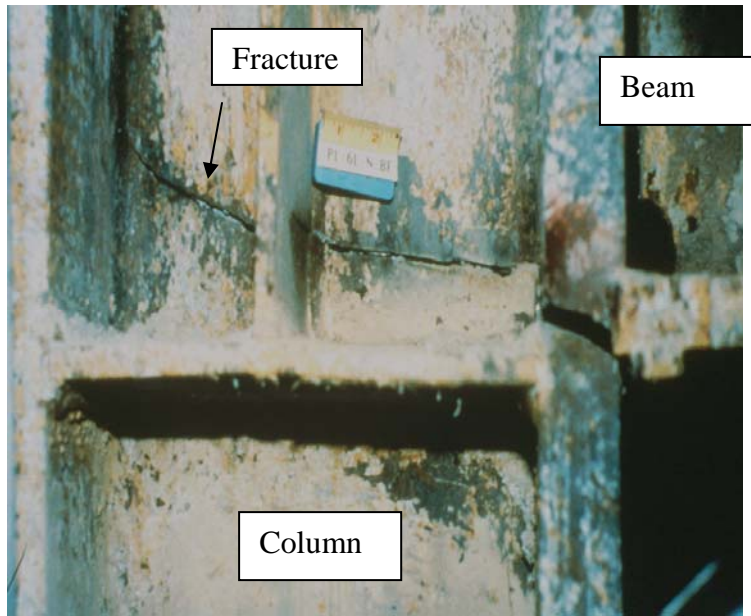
Seismic fracture in beam column connection in steel moment frame
